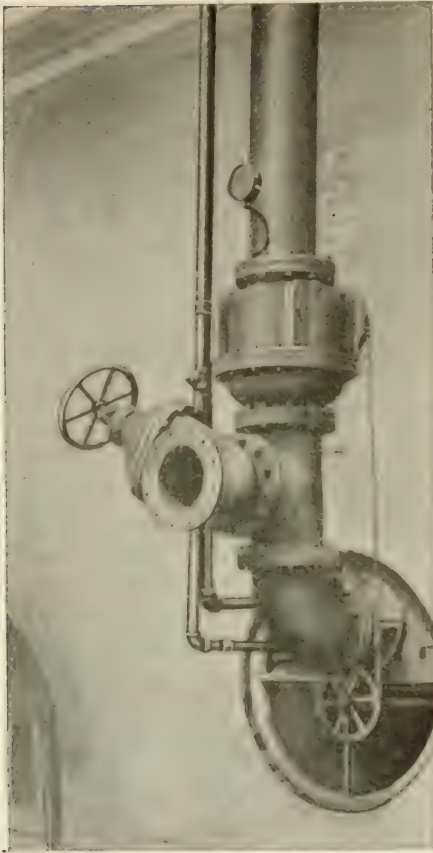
TYPICAL INSTALLATION OF COCHRANE MULTI-PORT SAFETY EXHAUST OUTLET VALVE
